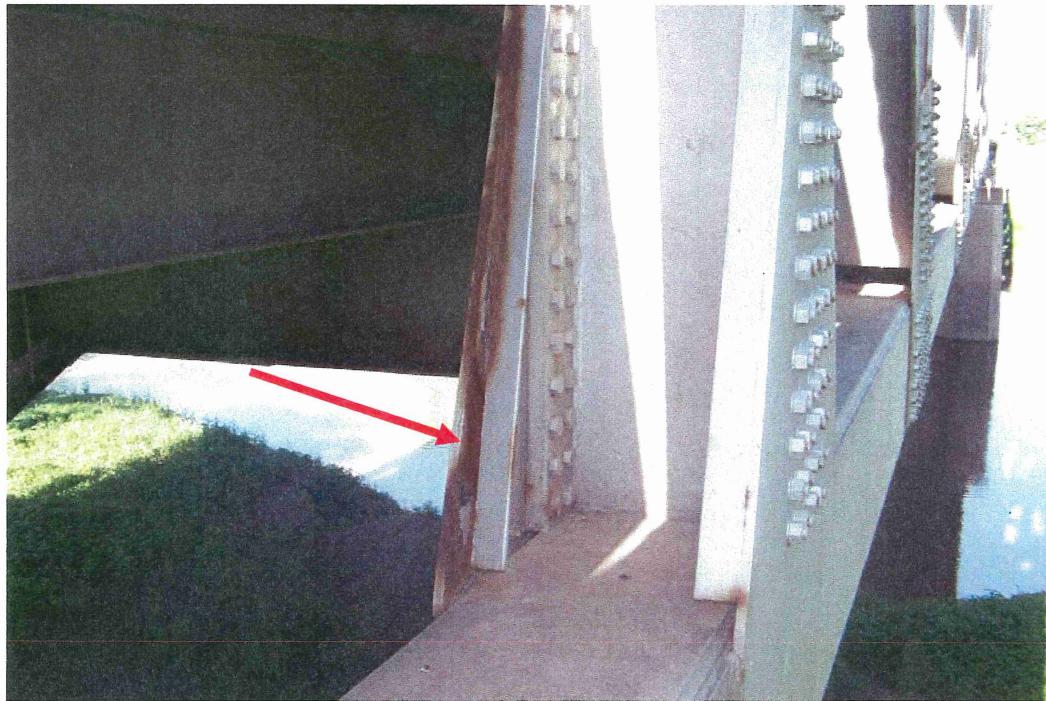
North Truss, East Span (Span 7), east side of panel point L1A', looking west. Note stiffening angles is partial detached from inner gusset plate. This stiffener was removed by inspector by hand. Looking west.
